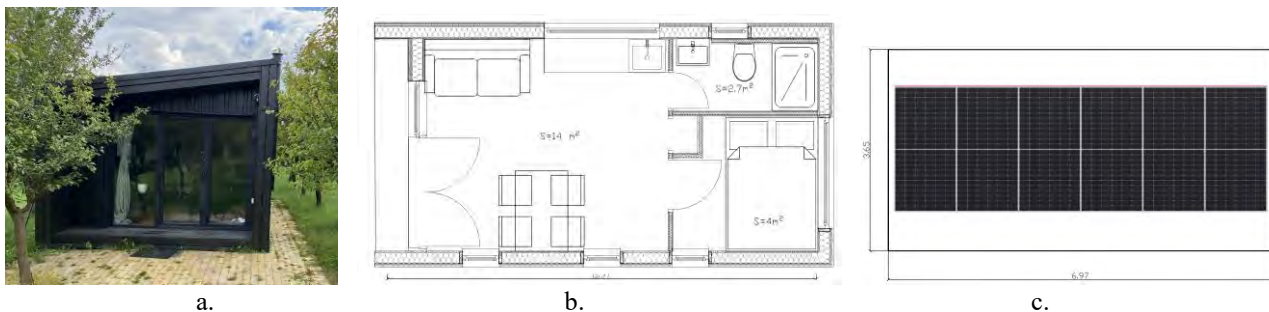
a. Front photo of the house; b. Floor plan; c. PV panels on the roof.
